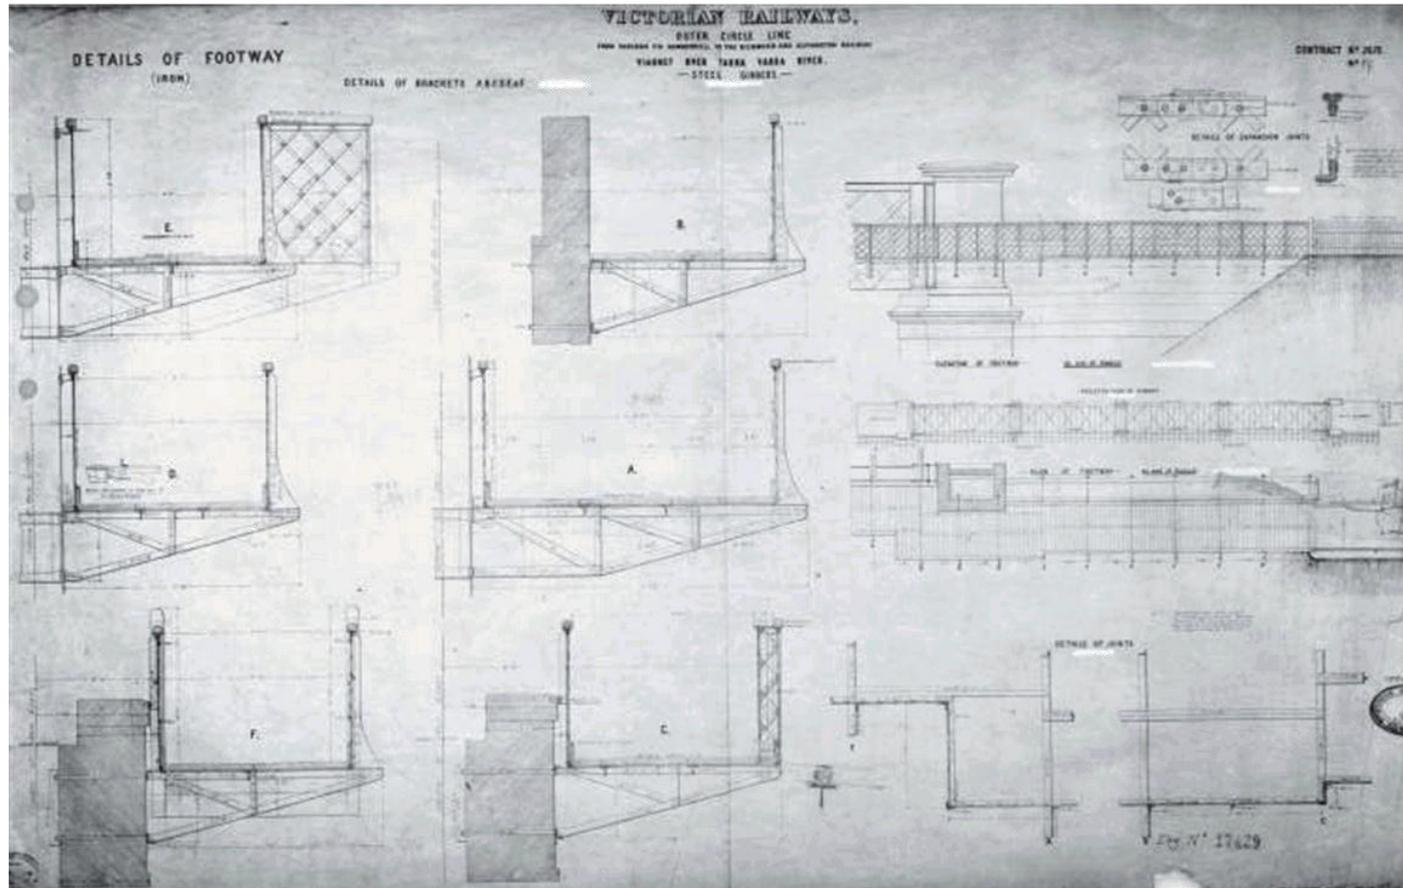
Victorian Railways Construction Drawing – details of walkway (source VicRoads)
